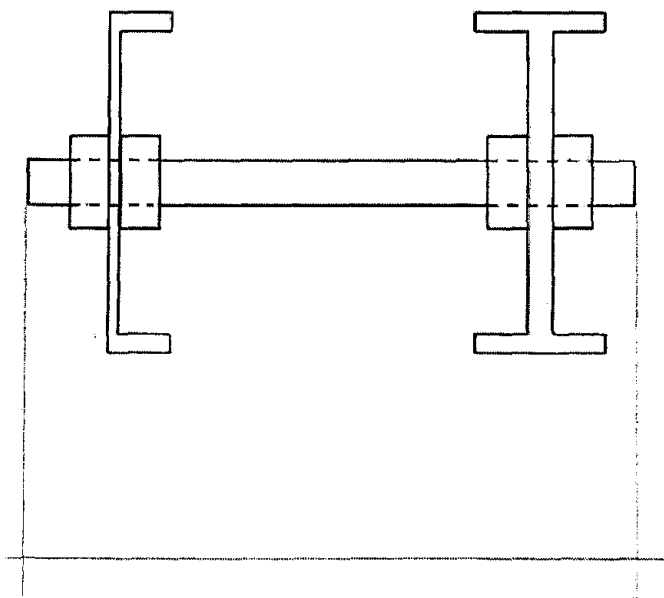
Detail of embedded channel and 1 1/2 in. diameter threaded rods in one leg of the load frame footing
